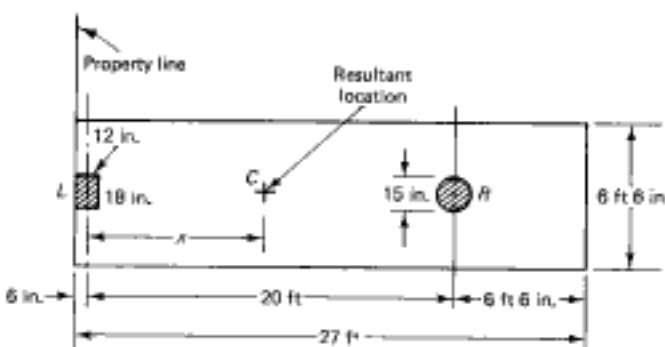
Combined footing plan geometry in Ex. 12.5.
